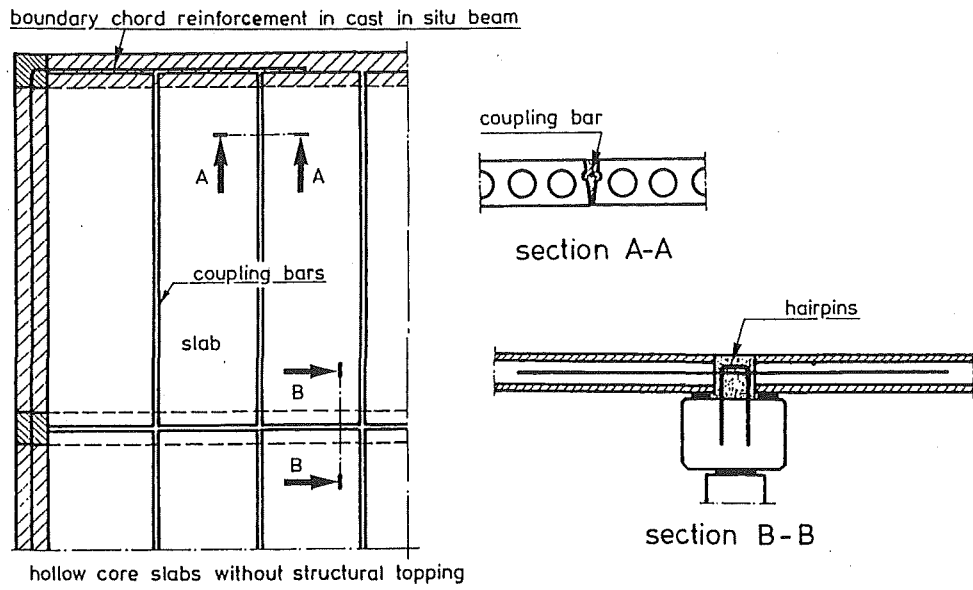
Grouted key tie bar details (coupling bars) [Bruggeling and Huyghe, 1991]
